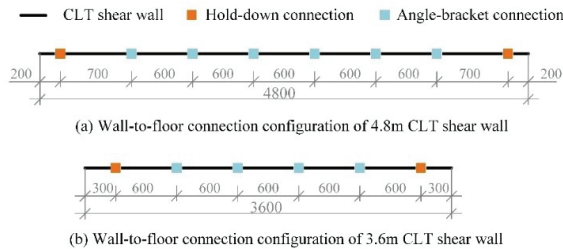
Configurations of wall-to-floor connections in CLT shear walls
